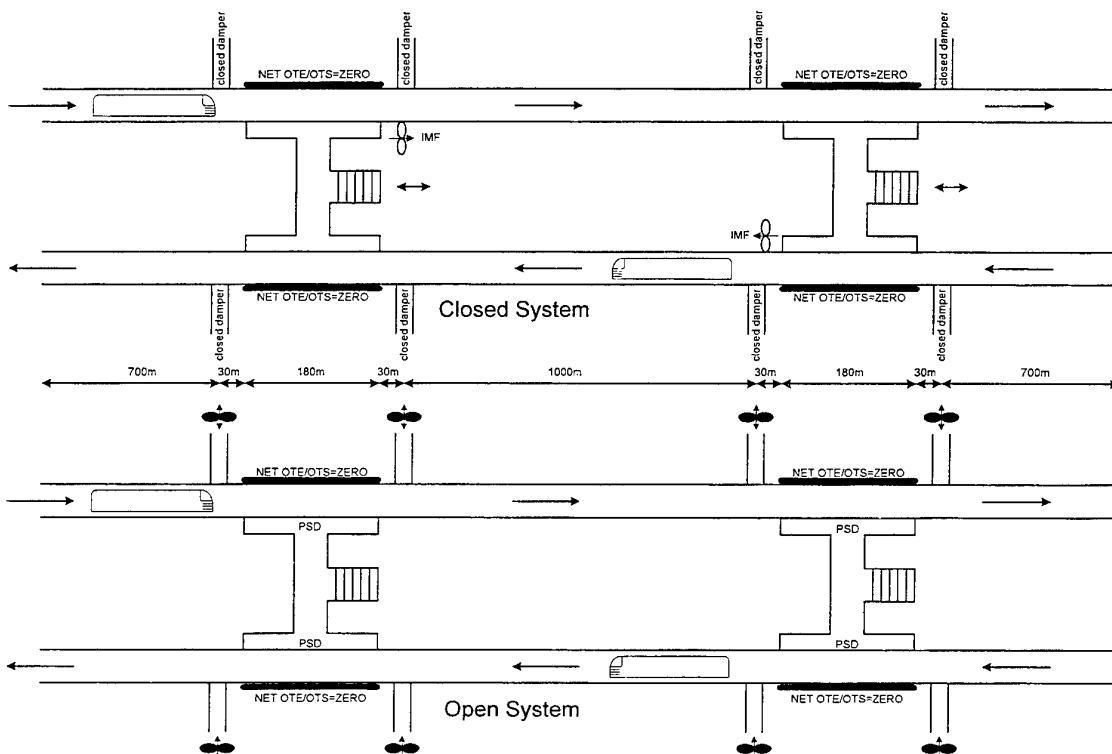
Layout of "Open" and "Closed" tunnel ventilation systems
